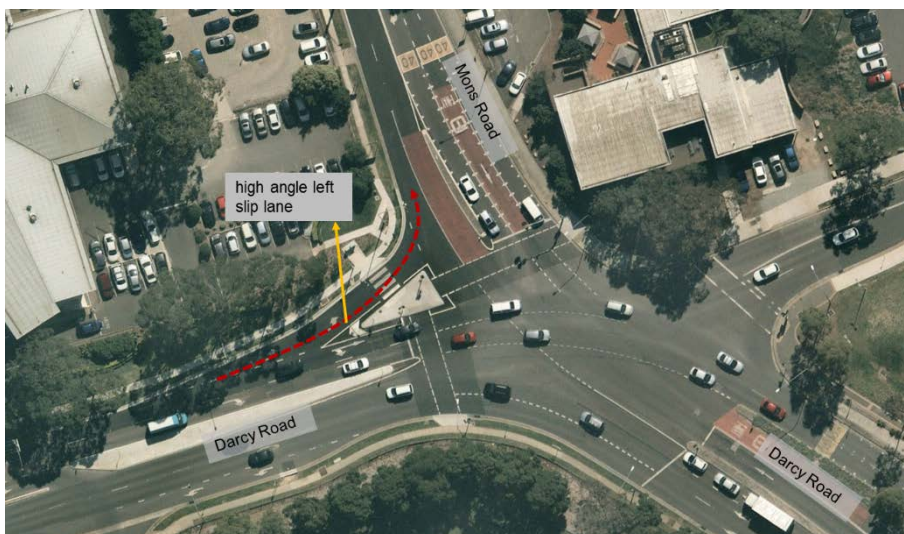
Upgraded Darcy Road / Mons Road Intersection Layout
